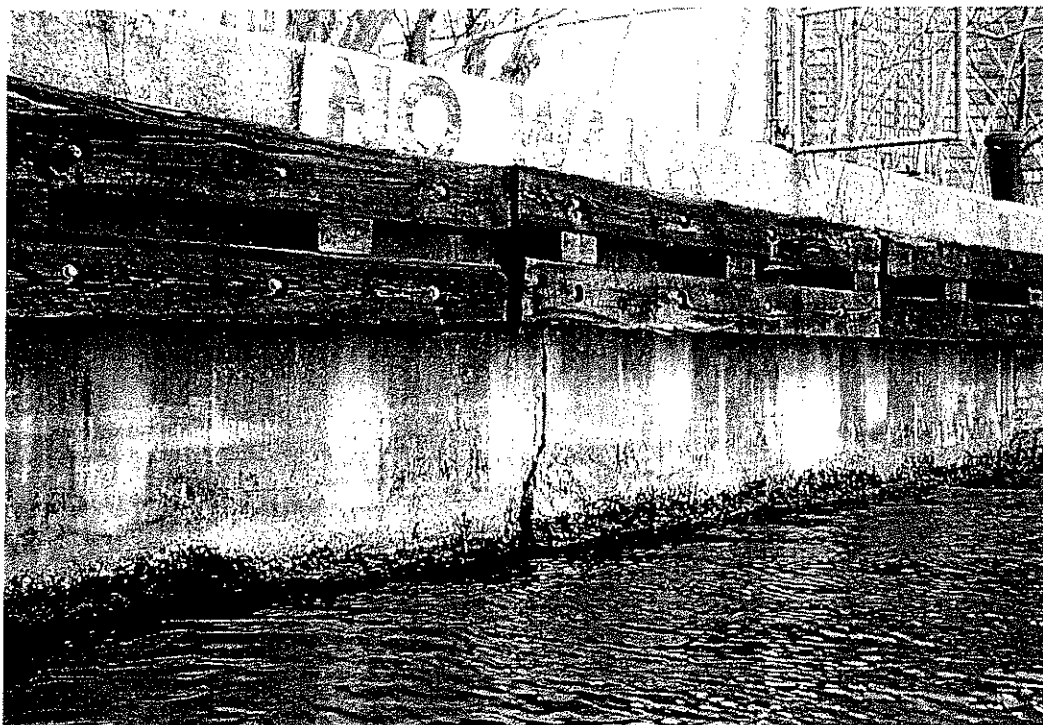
Overall View of South Dockwall Face, Looking Northwest from Station 3+66.
